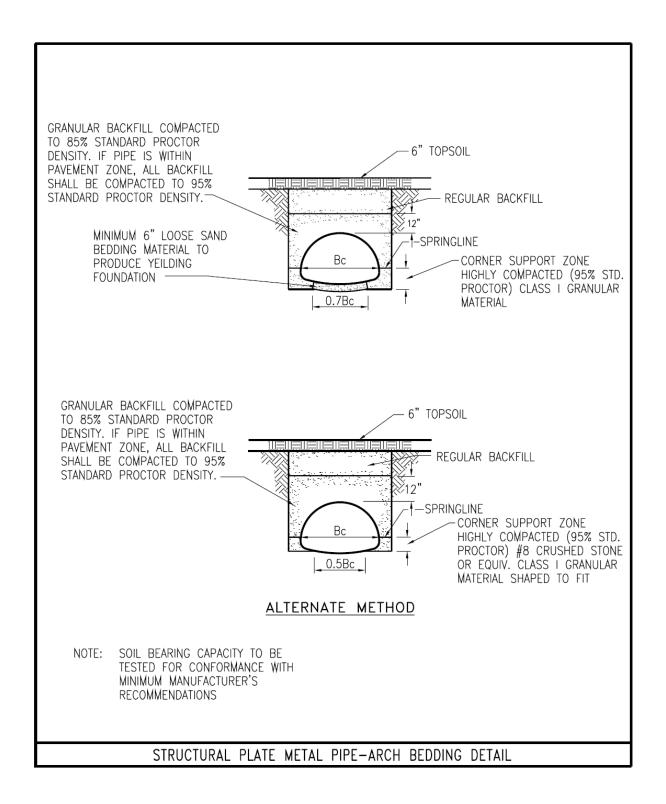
Structural Plate Metal Pipe-Arch Bedding Detail
